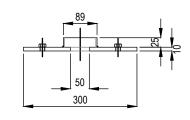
RETROFIT OPTION SHEET METAL CONDUIT COVER
